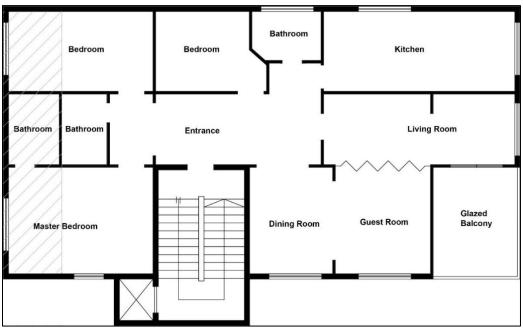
A High-Rise Building Apartment Floor Plan in Tanzeem Kafar-Sousah
